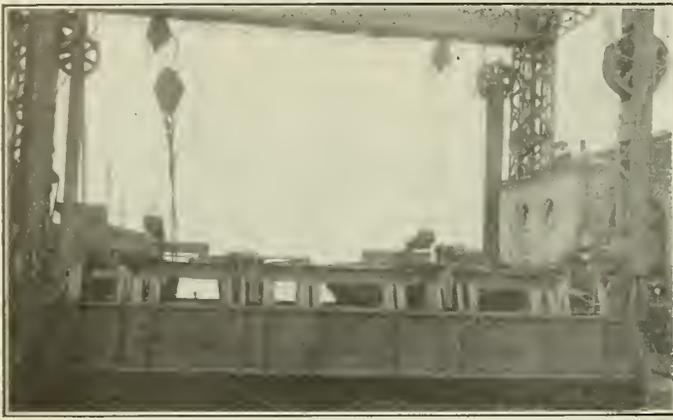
Apron connected to Girder E. Note Shoes for connection of Intermediate Span Girders and Springers.
